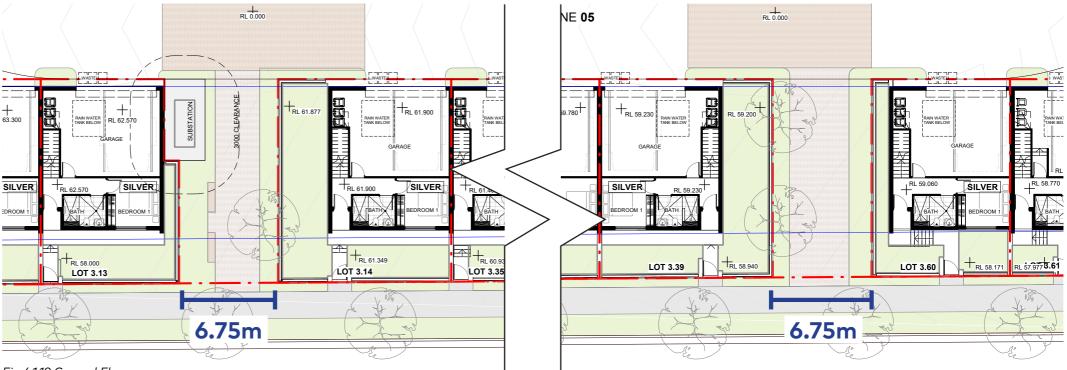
Ground Floor Previous Pedestrian Link Buchan Ave
